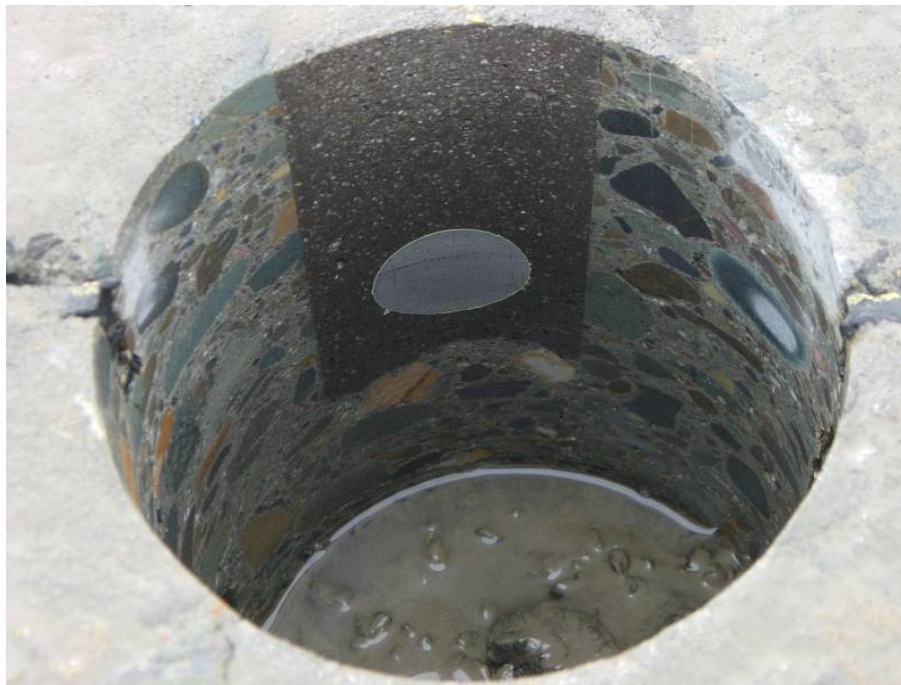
Good consolidation of patching material in dowel bar retrofit slot.
